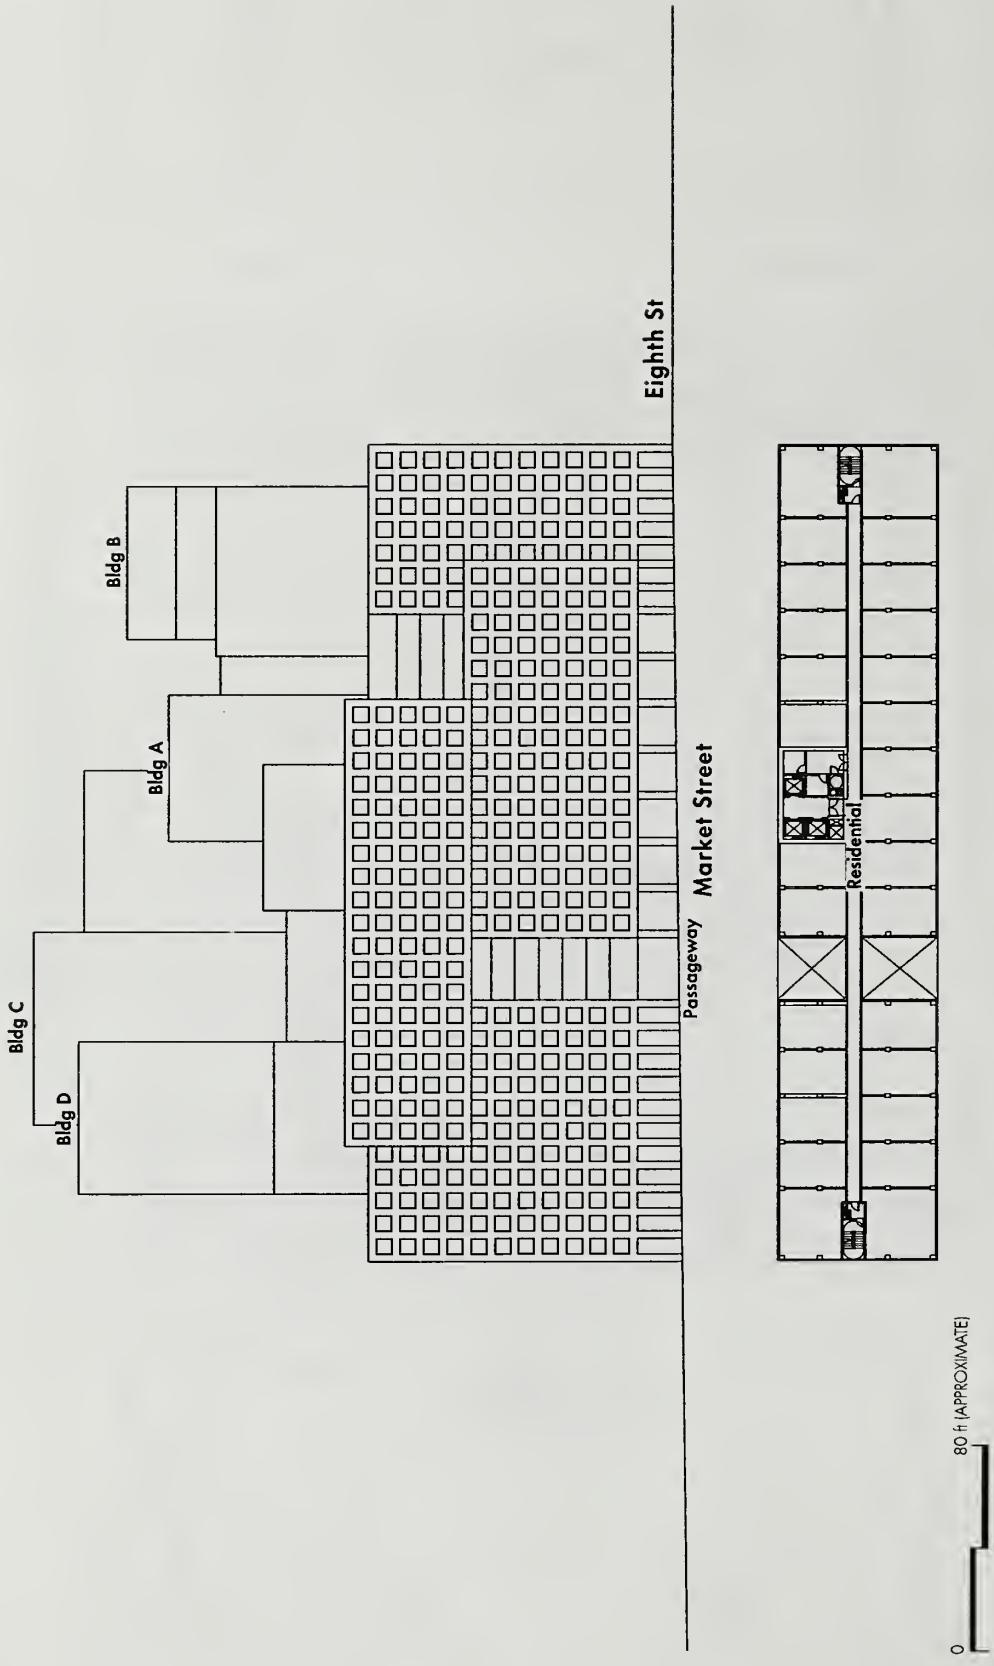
MARKET STREET ELEVATION AND TYPICAL FLOOR PLAN (BUILDING E)
